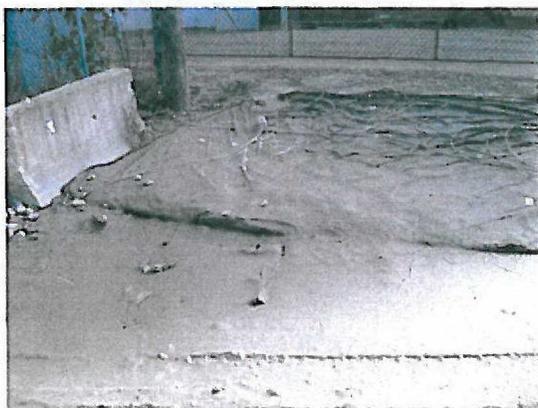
The combination of a dewatering bag and storm drain inlet protection appear to be effective at controlling sediment from dewatering activities. Please remove accumulated sediments from the inlet protection to allow maintain continued function.
